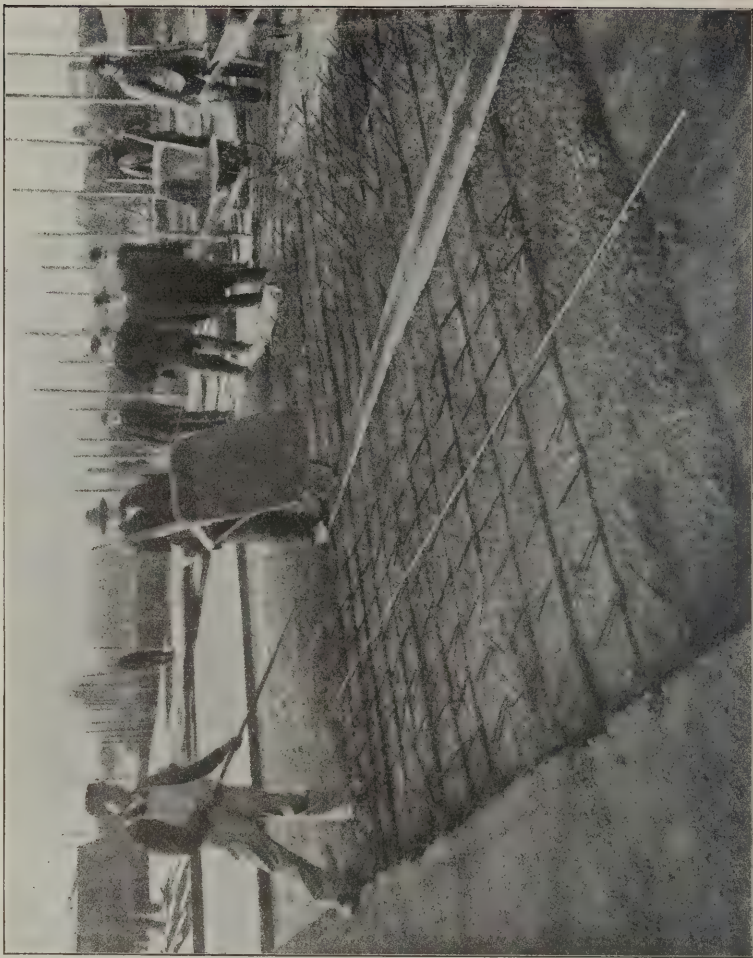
CONSTRUCTING KAHN FLOORS.
